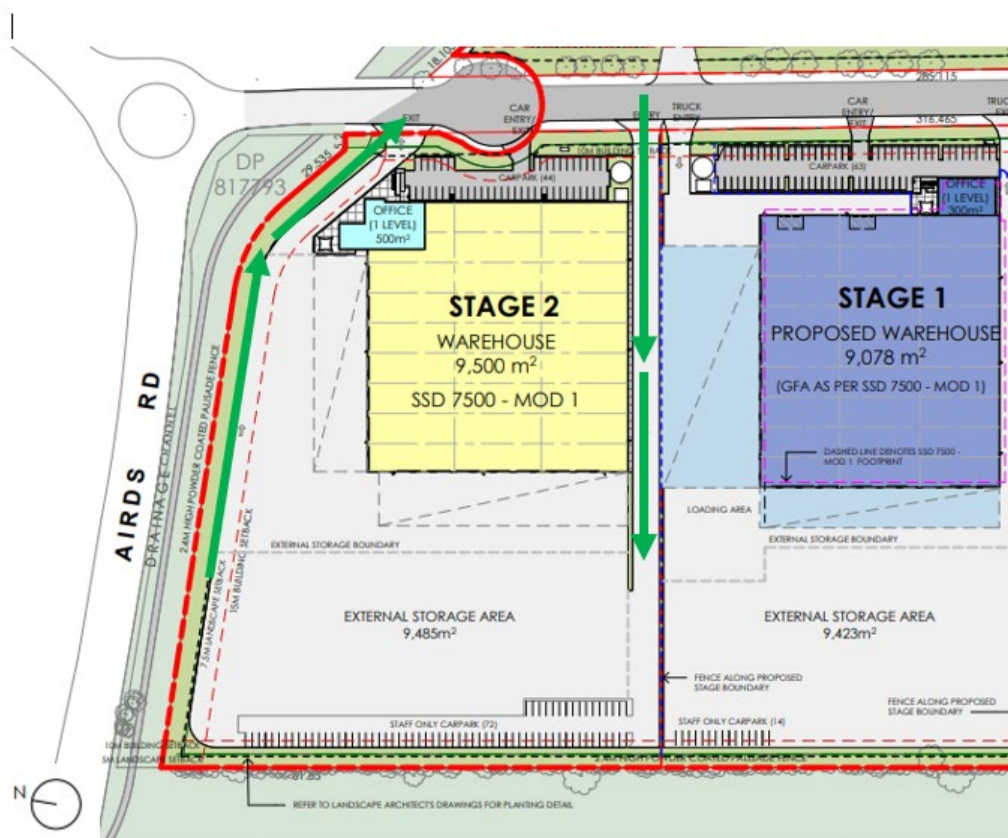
| One-directional access driveway from the southern access with all exit movements undertaken from the northern egress driveway.
